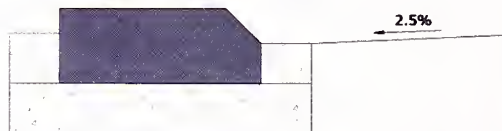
A Standard Design of Mountable Concrete Kerb
